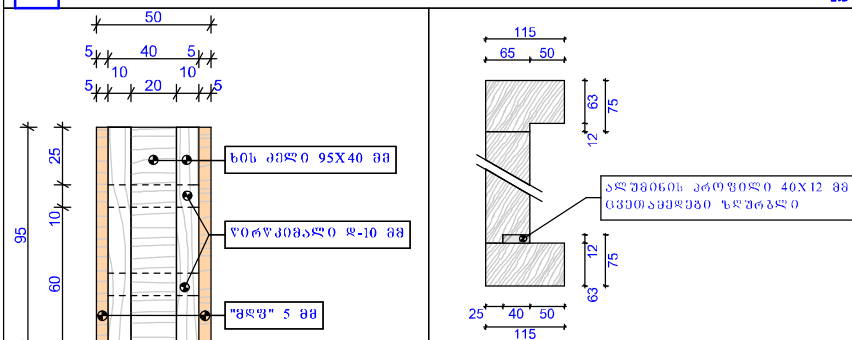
Side view of the door. Dimensions: Thickness 50 mm.
